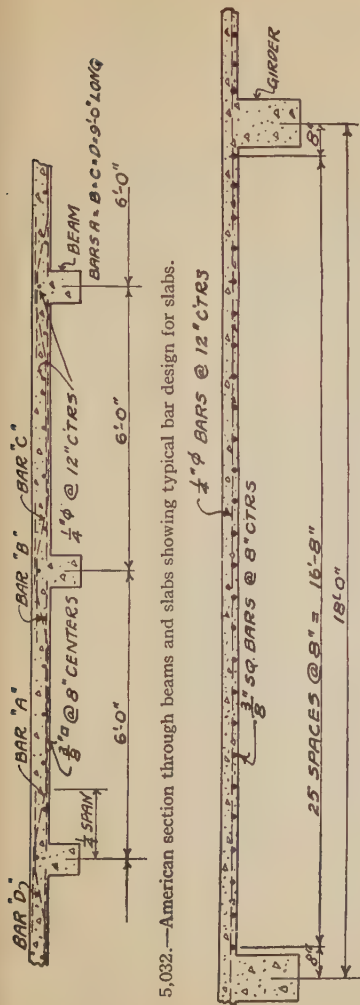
,032.—American section through beams and slabs showing typical bar design for slabs.
